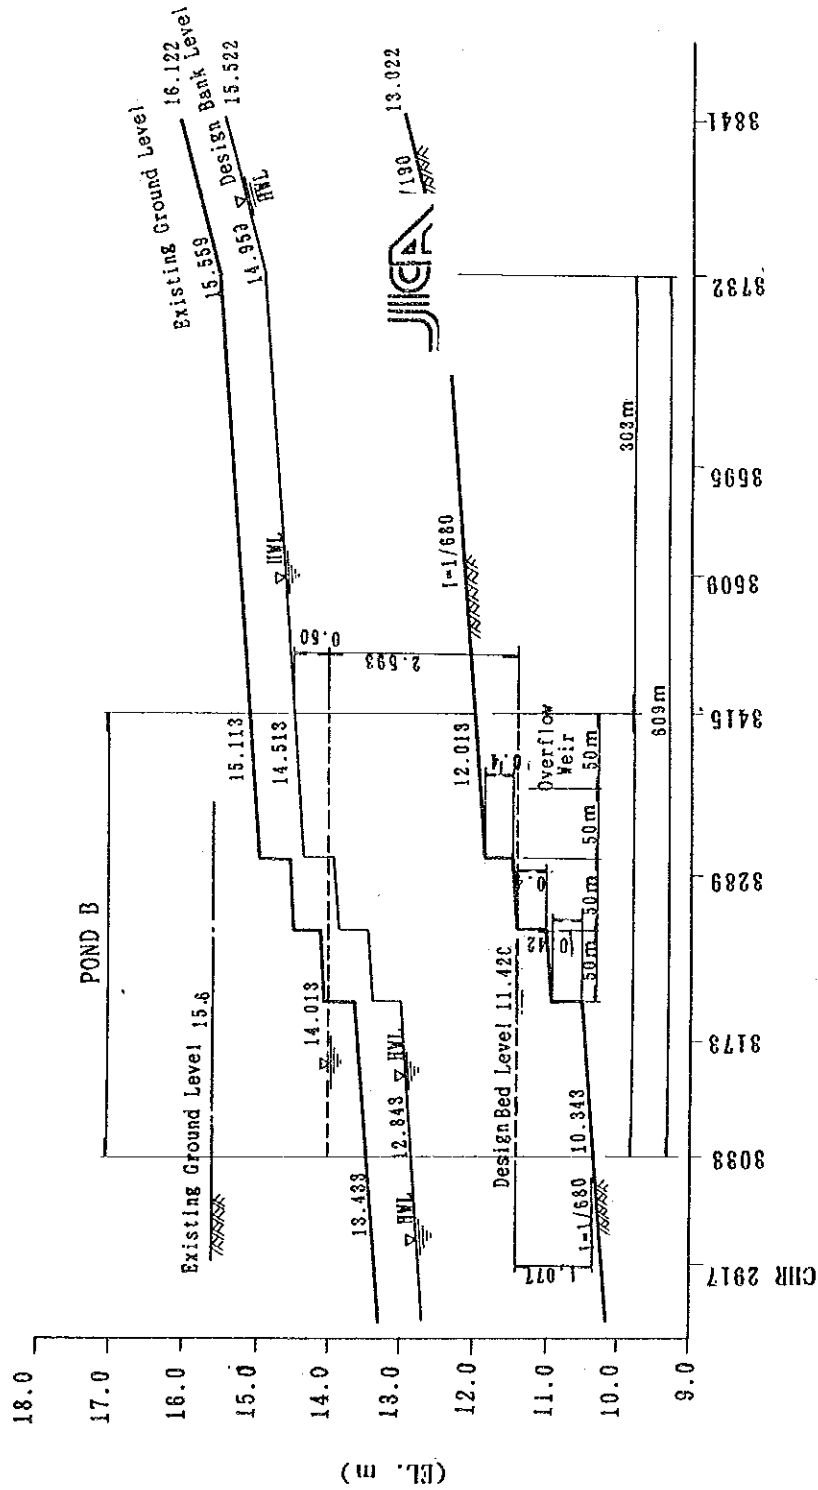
LONGITUDINAL SECTION OF RETENTION POND B
